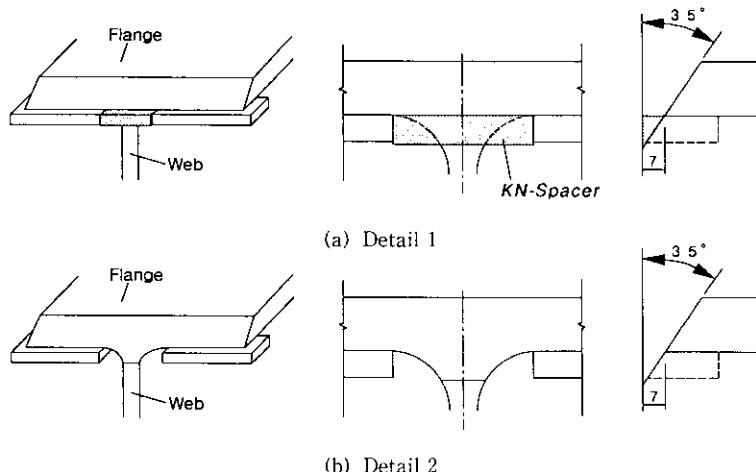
Detail of welded joints in KNNS welding method
